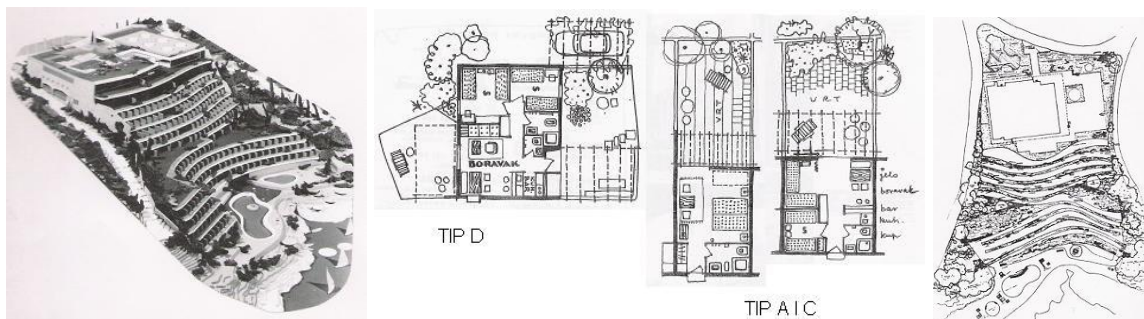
Hotel Libertas (Dubrovnik): Model, Modular floor plans, Horticultural plan (Source: Andrija Čičin-Šain)
